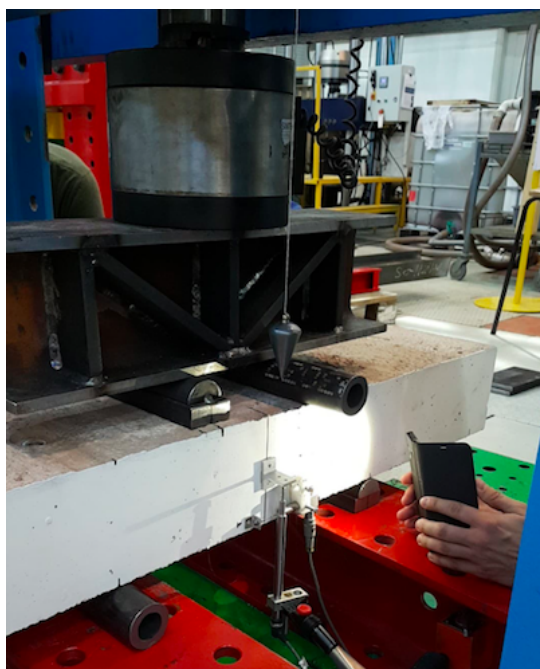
Picture from the 4-point bend testing of one of the  $\phi 10$ mm aluminium reinforced concrete beams.
